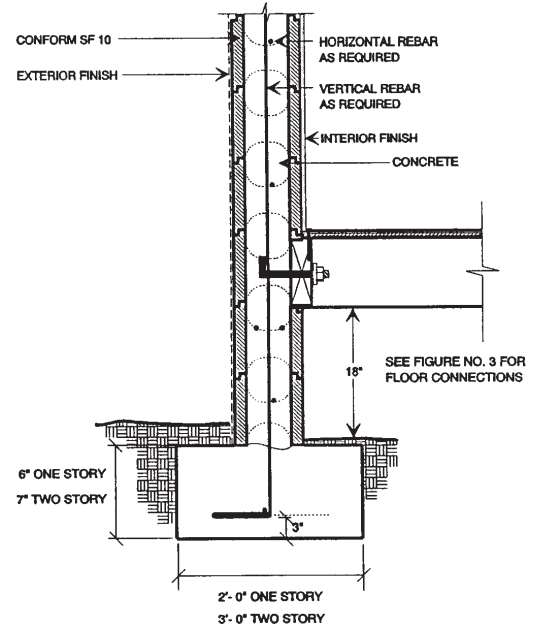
CONNECTIONS TO ROOFS AND FLOORS
